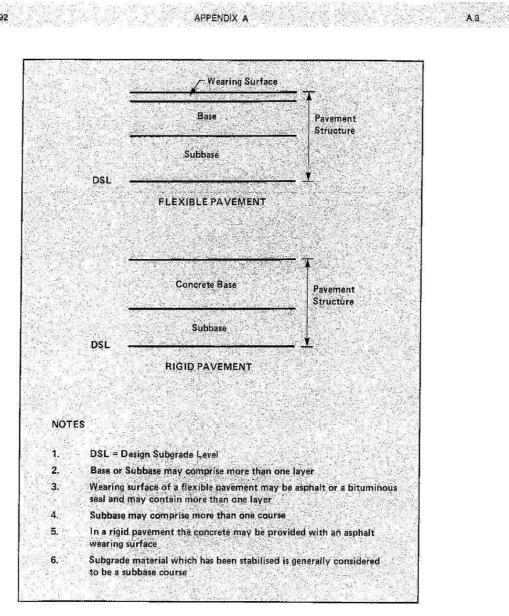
COMPONENTS OF FLEXIBLE AND RIGID ROAD PAVEMENT STRUCTURES
